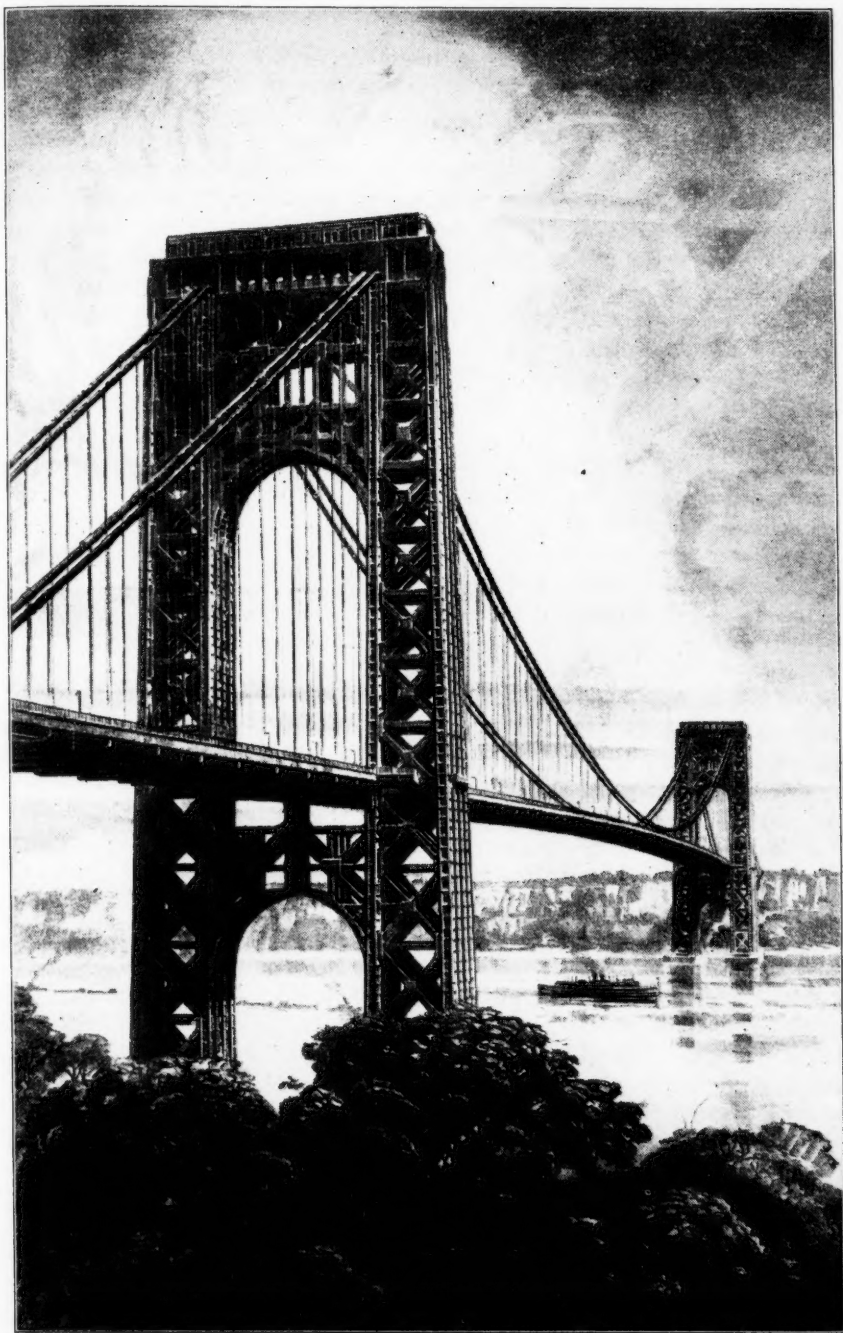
ARTIST'S SKETCH OF STEEL TOWER WITH PROTECTED OBSERVATION PLATFORM.
